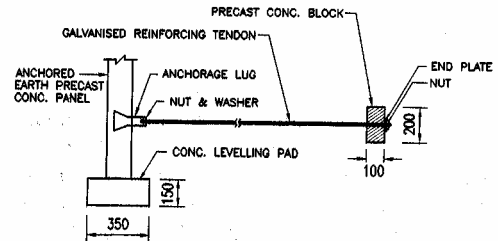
Typical Arrangement of Facing Panel, Reinforcing Tendons and Anchor Block
